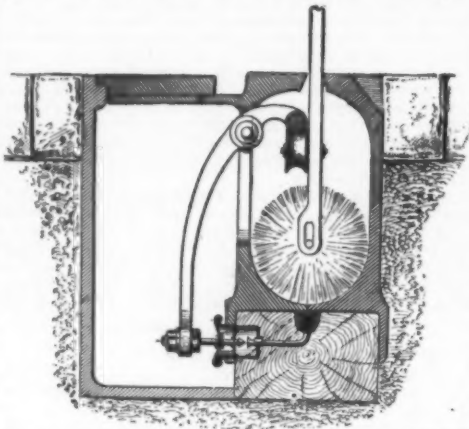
CONTACT BOX, LA BURT CONDUIT RAILWAY.
